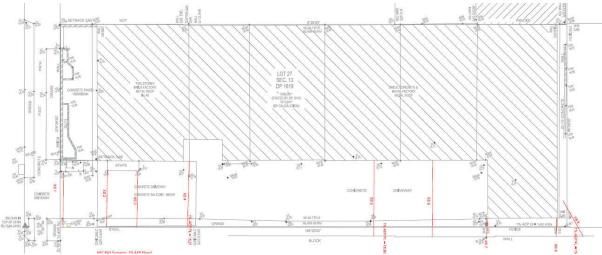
Site survey and cross sections, see drawing C-3619-01 for better resolution
